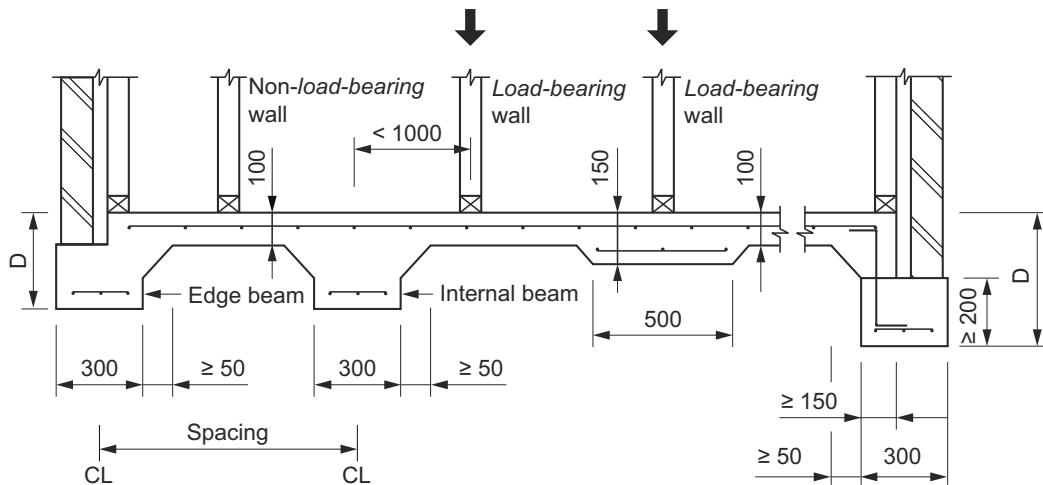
Footing slab and stiffened raft slab details for Class M sites
